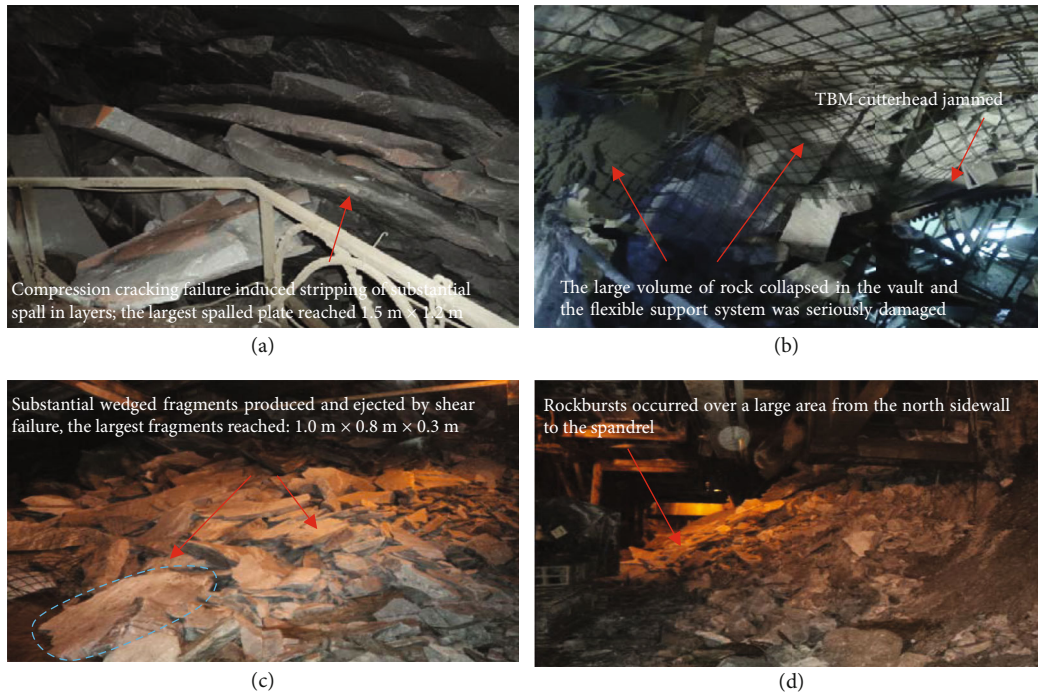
On-site photos showing the failure caused by strain rockburst. (a) Spalling caused by compression-induced tensile damage. (b) Damage of shotcrete and flexible support system. (c, d) A large area of damaged rockmass occurred along the tunnel axis, a large number of blasting blocks fell across the south and north side walls, and the tunnel collapsed in an all-round way.
